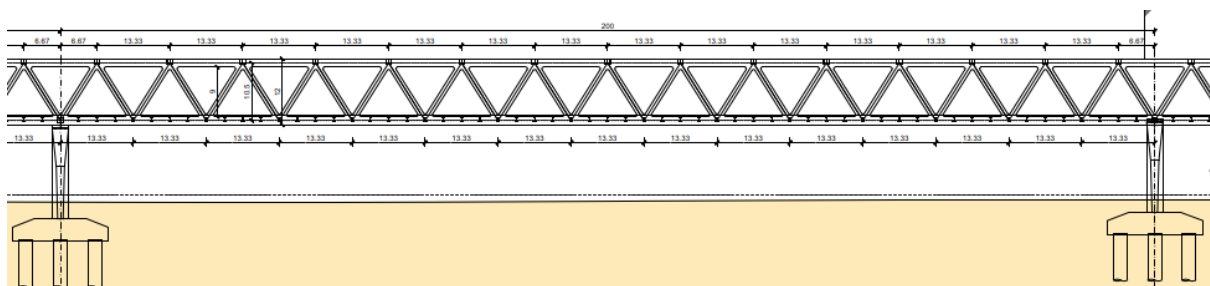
Elevation of the 200m span trusses for Chilmari-Rowmari.
